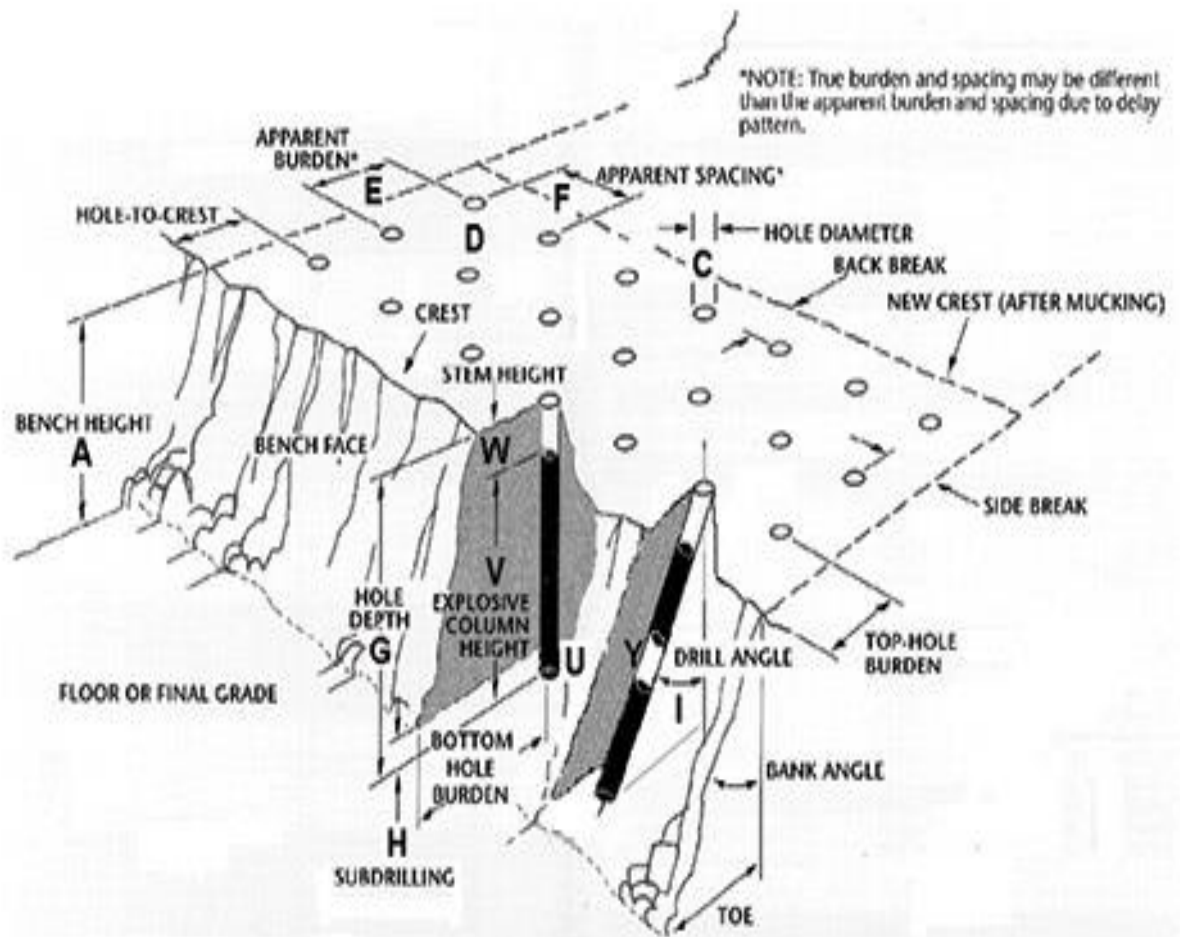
shows common nomenclature used for bench blast design in open-pit mining;
